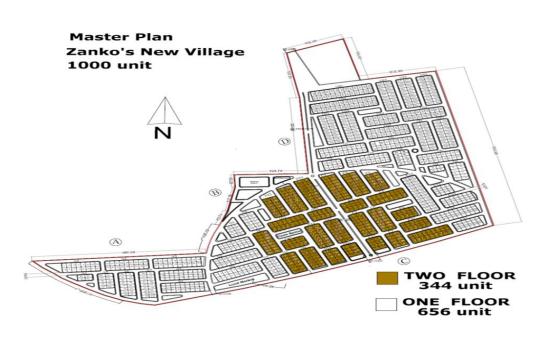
Master Plan of Zanko's New Village of 1000 Houses for Academic Staff
